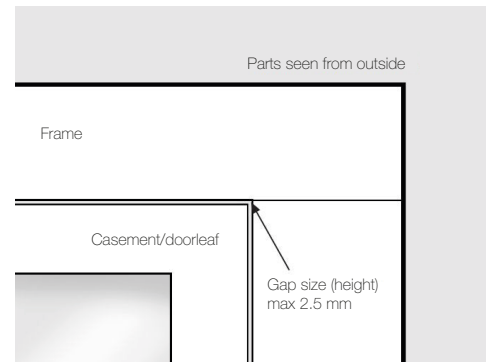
Adjusting casement height is done with the setting screw in the hinge.
